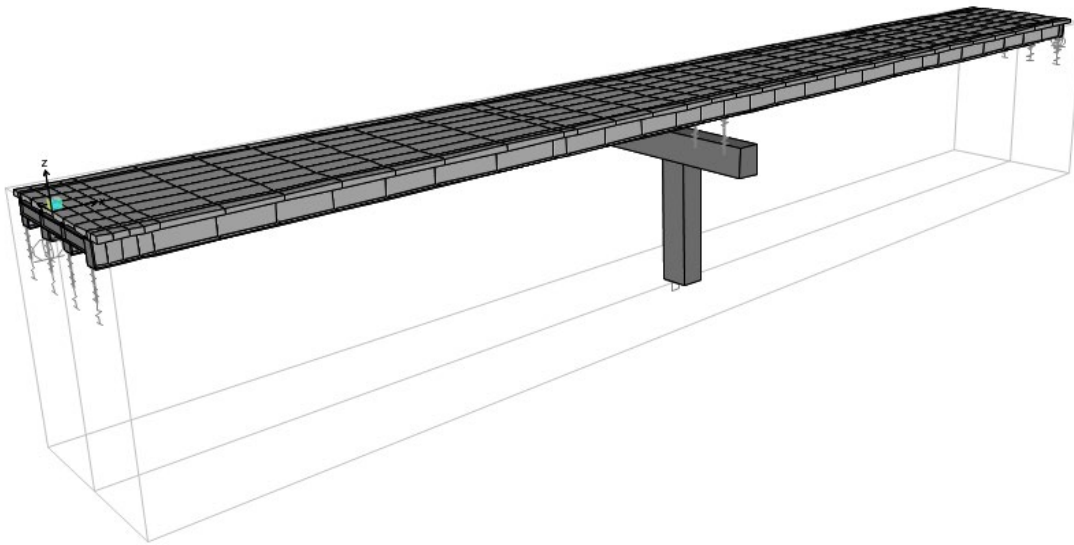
CSi Bridge Model of the Mountbatten Bridge.
